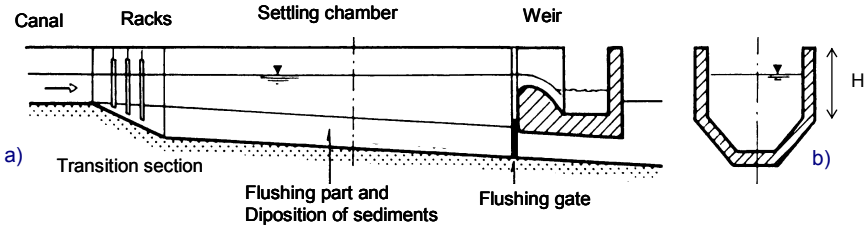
Layout of Büchi flushing system: a) longitudinal section; b) cross section [1]
